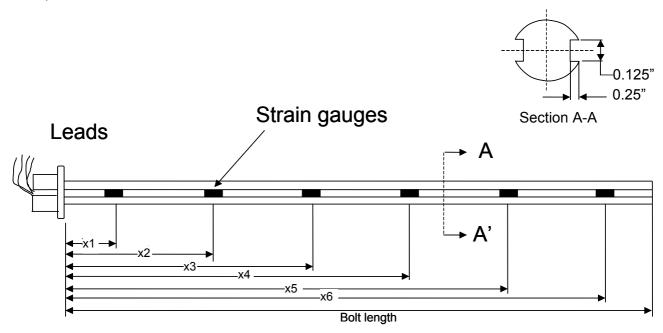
Instrumented roof bolt (after Signer and Jones 1990)
